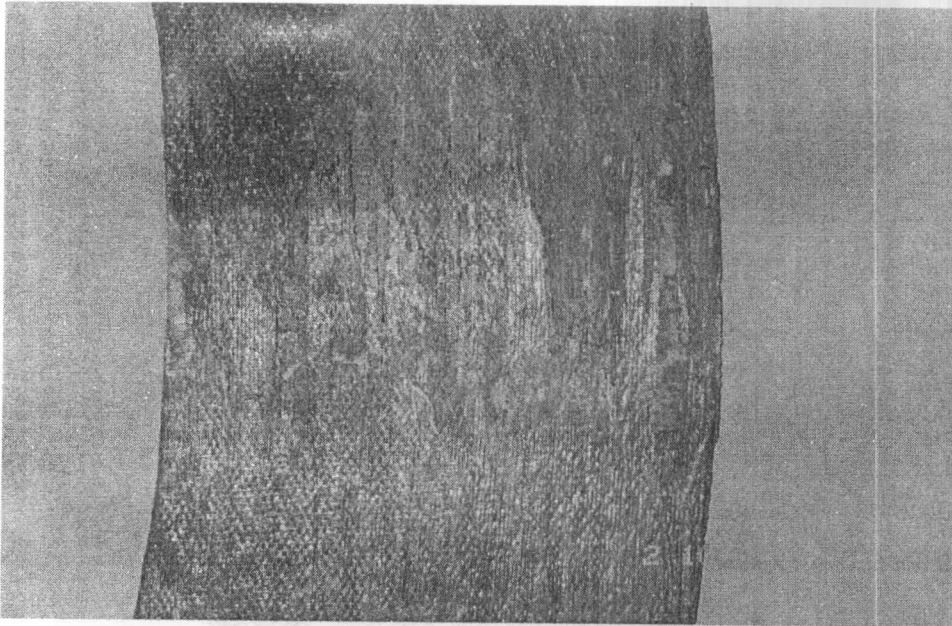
Rupture of CFRP sheets used for bridge model C-2.
